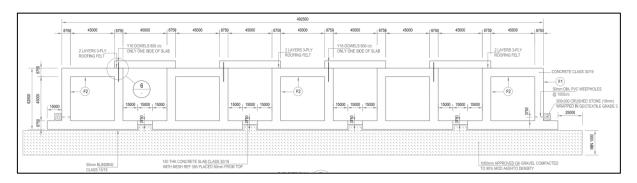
Proposed typical designs for large drainage structures. Source: AURECON (2020).
